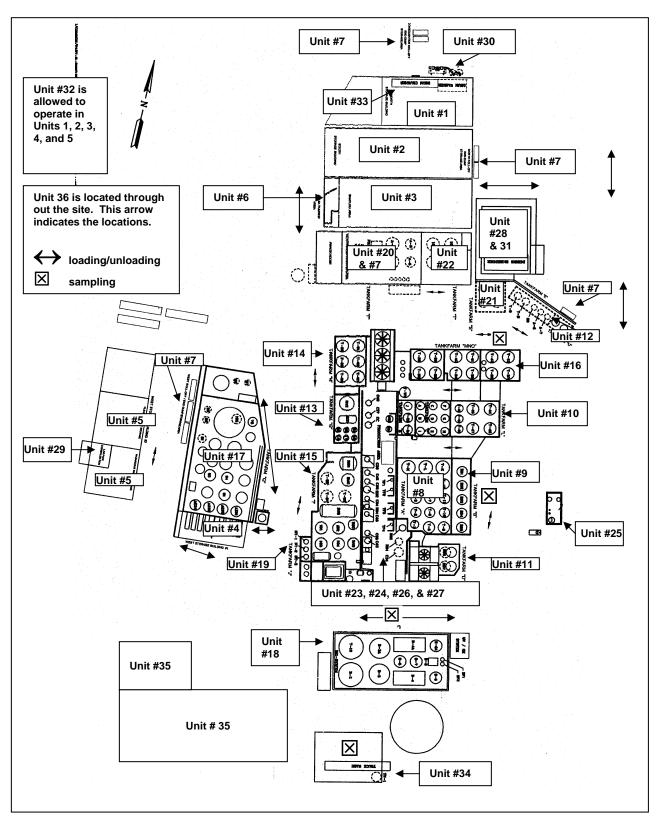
DRUM STORAGE AND TANK STORAGE DETAILS
